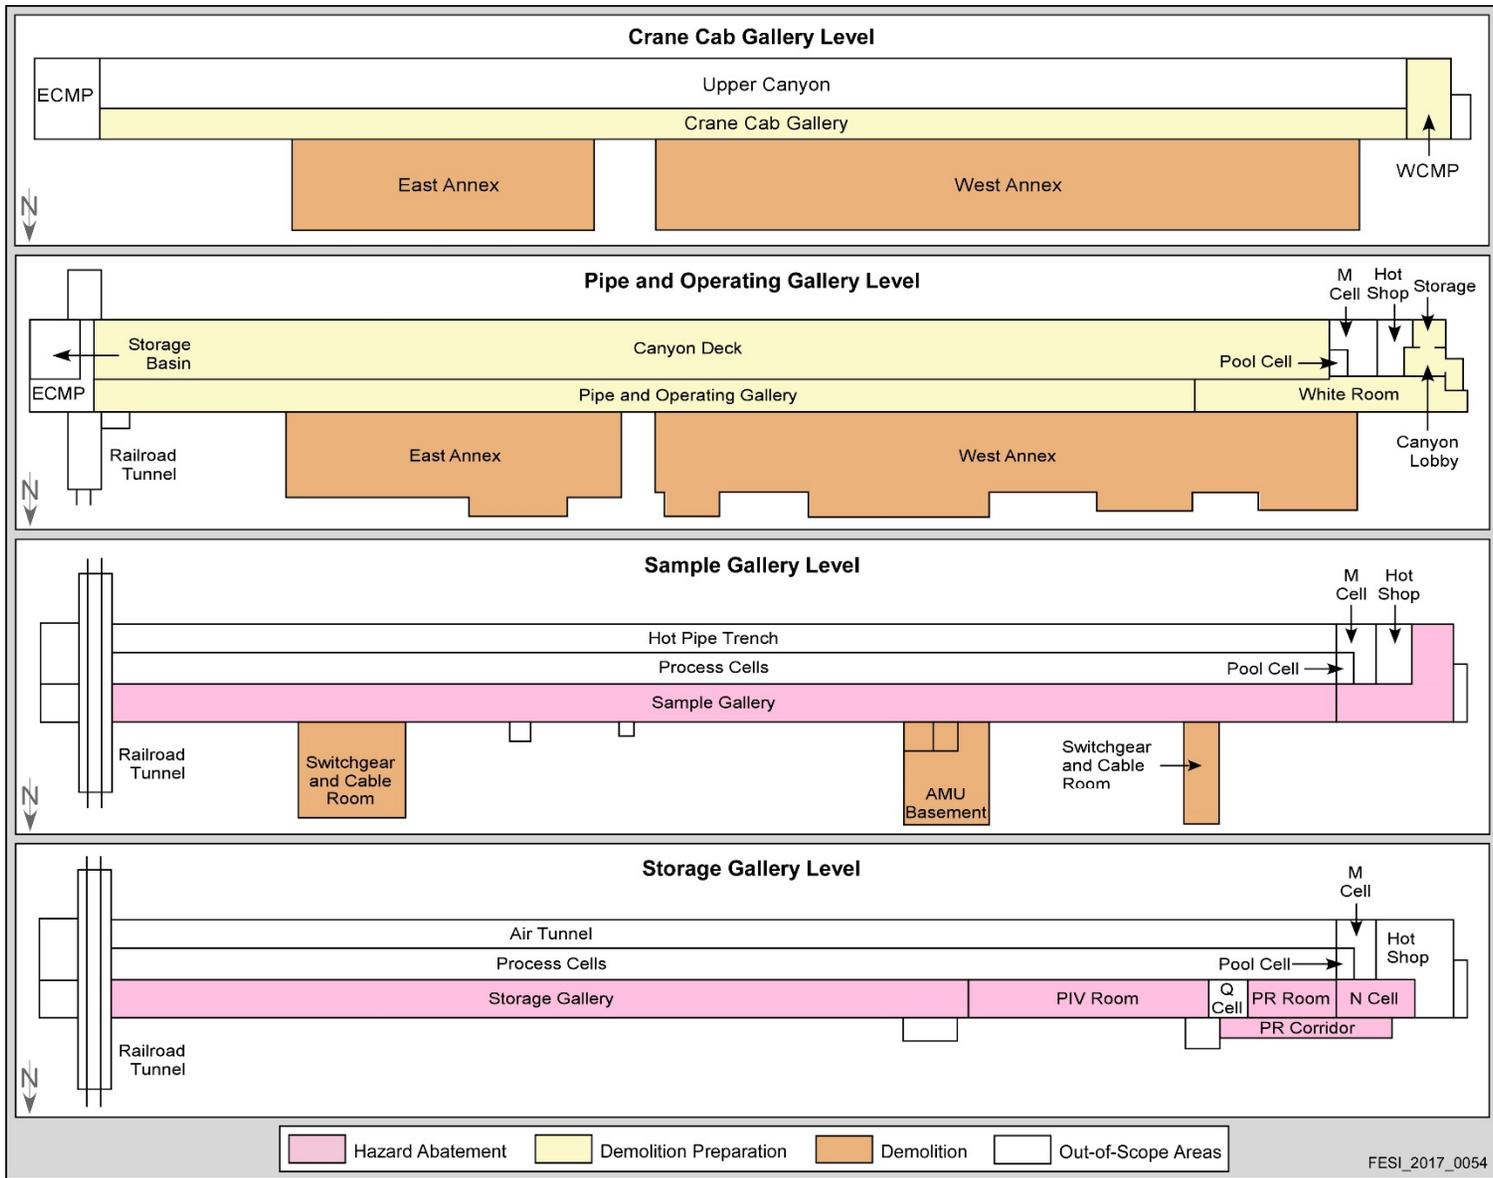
Alternative 4 Plan View – Proposed Actions per Level
